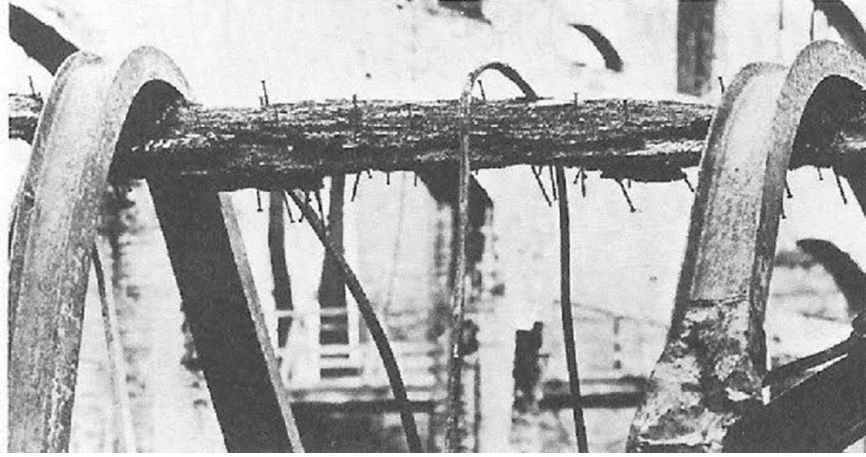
View of wooden beam molten steel beams (2 IPE) and flooring reinforcement after fire
